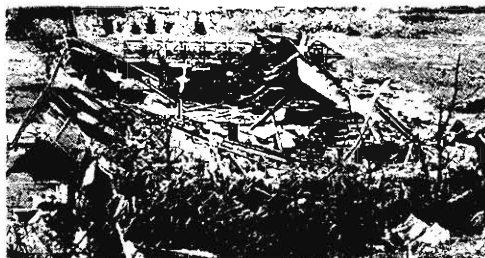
Damage to wooden building with cement-tile roofing :
